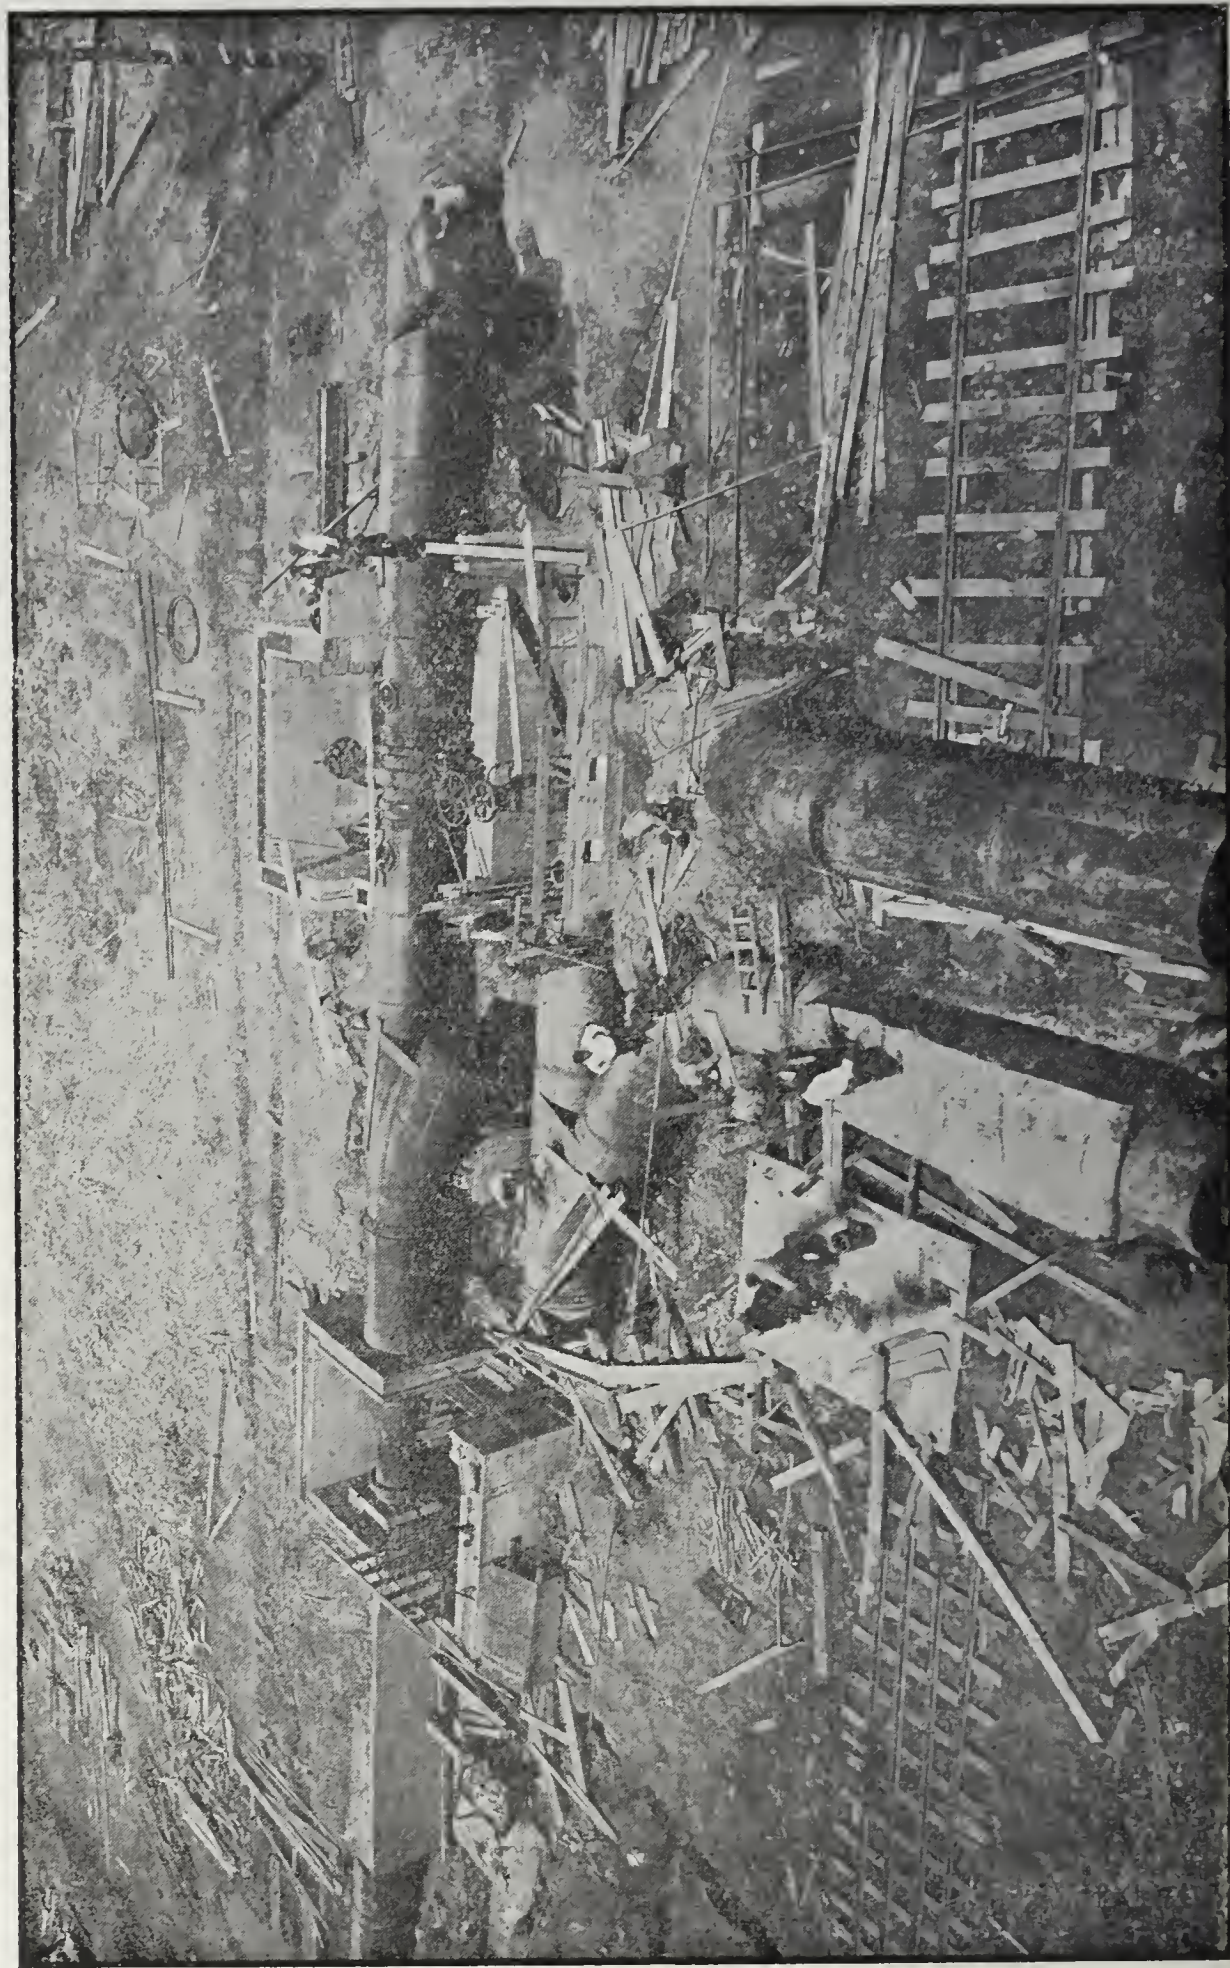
60 inch Steel Pipe Connections at Gate House.
